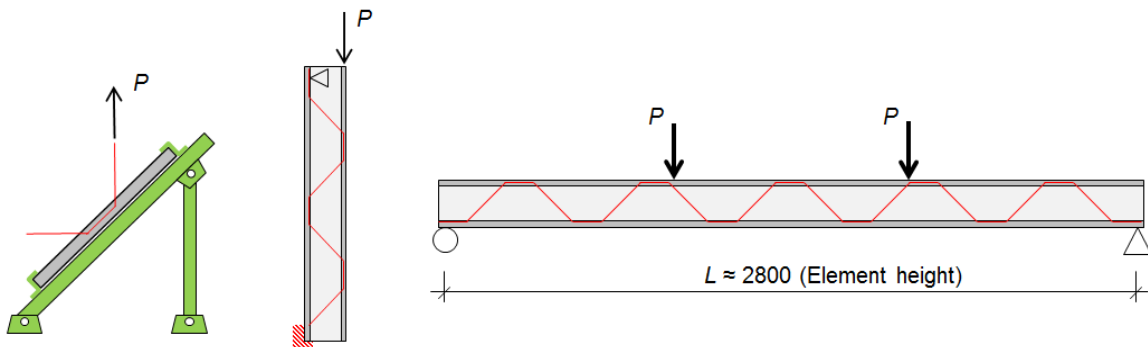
a) Local failure test of the connectors, b) shear test of the connectors and c) 4-point bending test of a panel strip.
